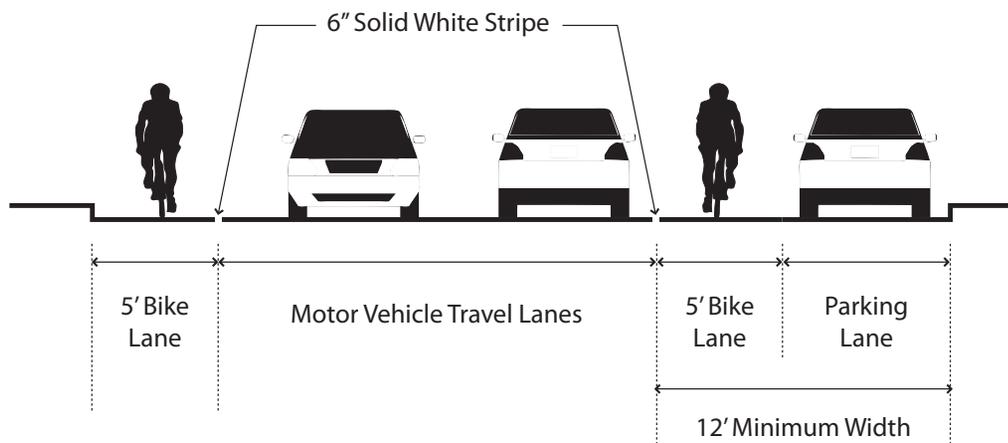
Class II bike lane cross section adjacent to curb and gutter and adjacent to parallel parking
